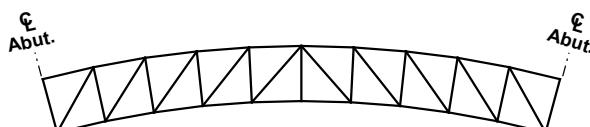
Pratt-type Single-diagonal Top Lateral Bracing System for Tub Section Member: Plan View
